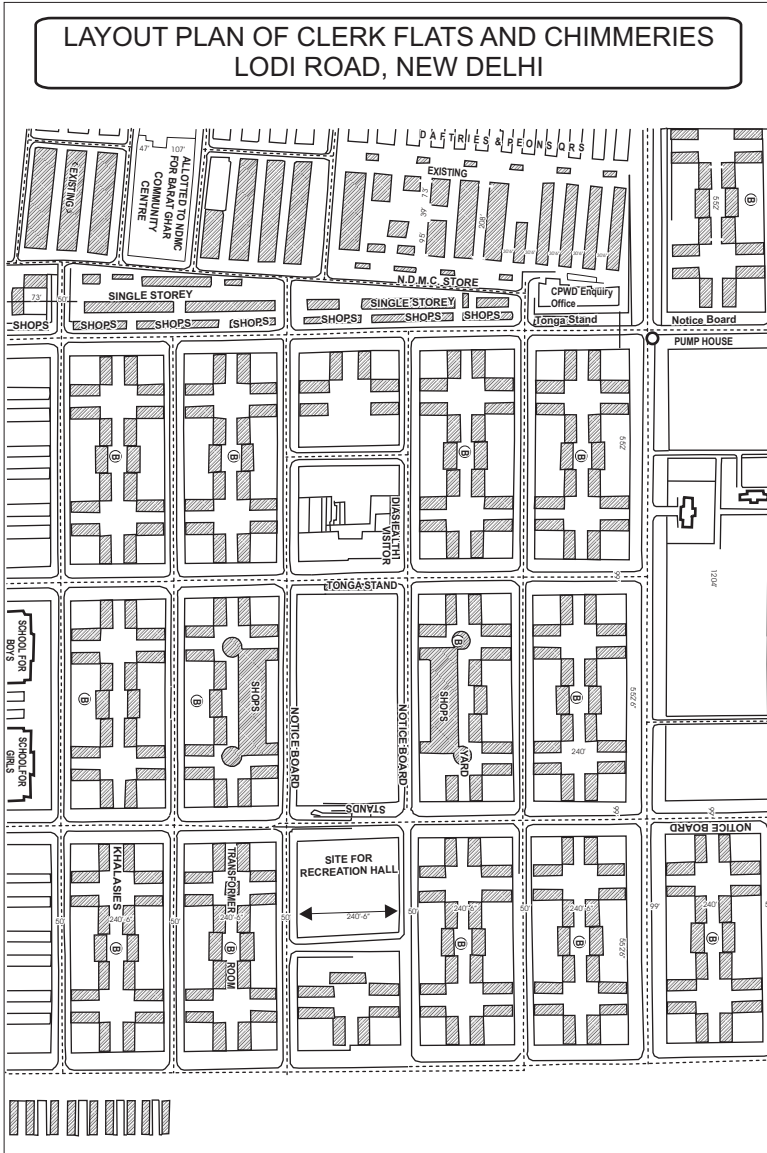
Layout Plan of Lodi Colony, c. 1940
